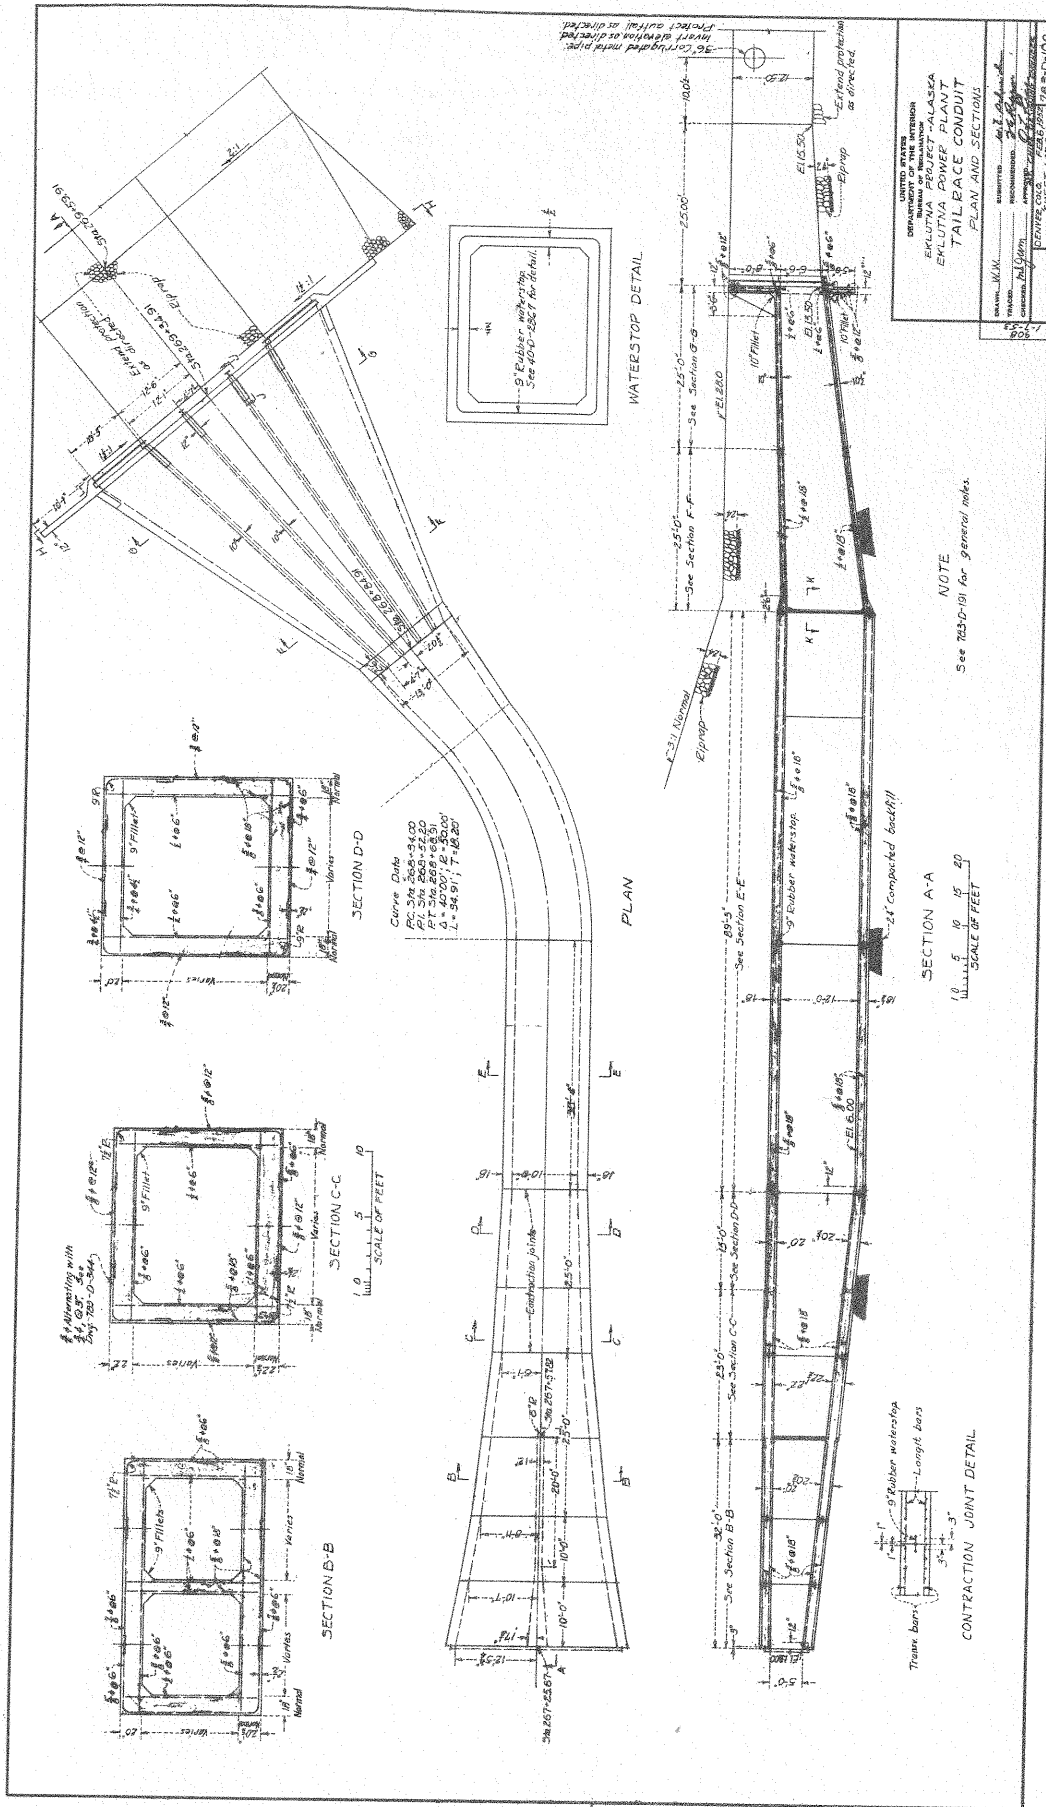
Plan and sections of powerplant tailrace conduit.
